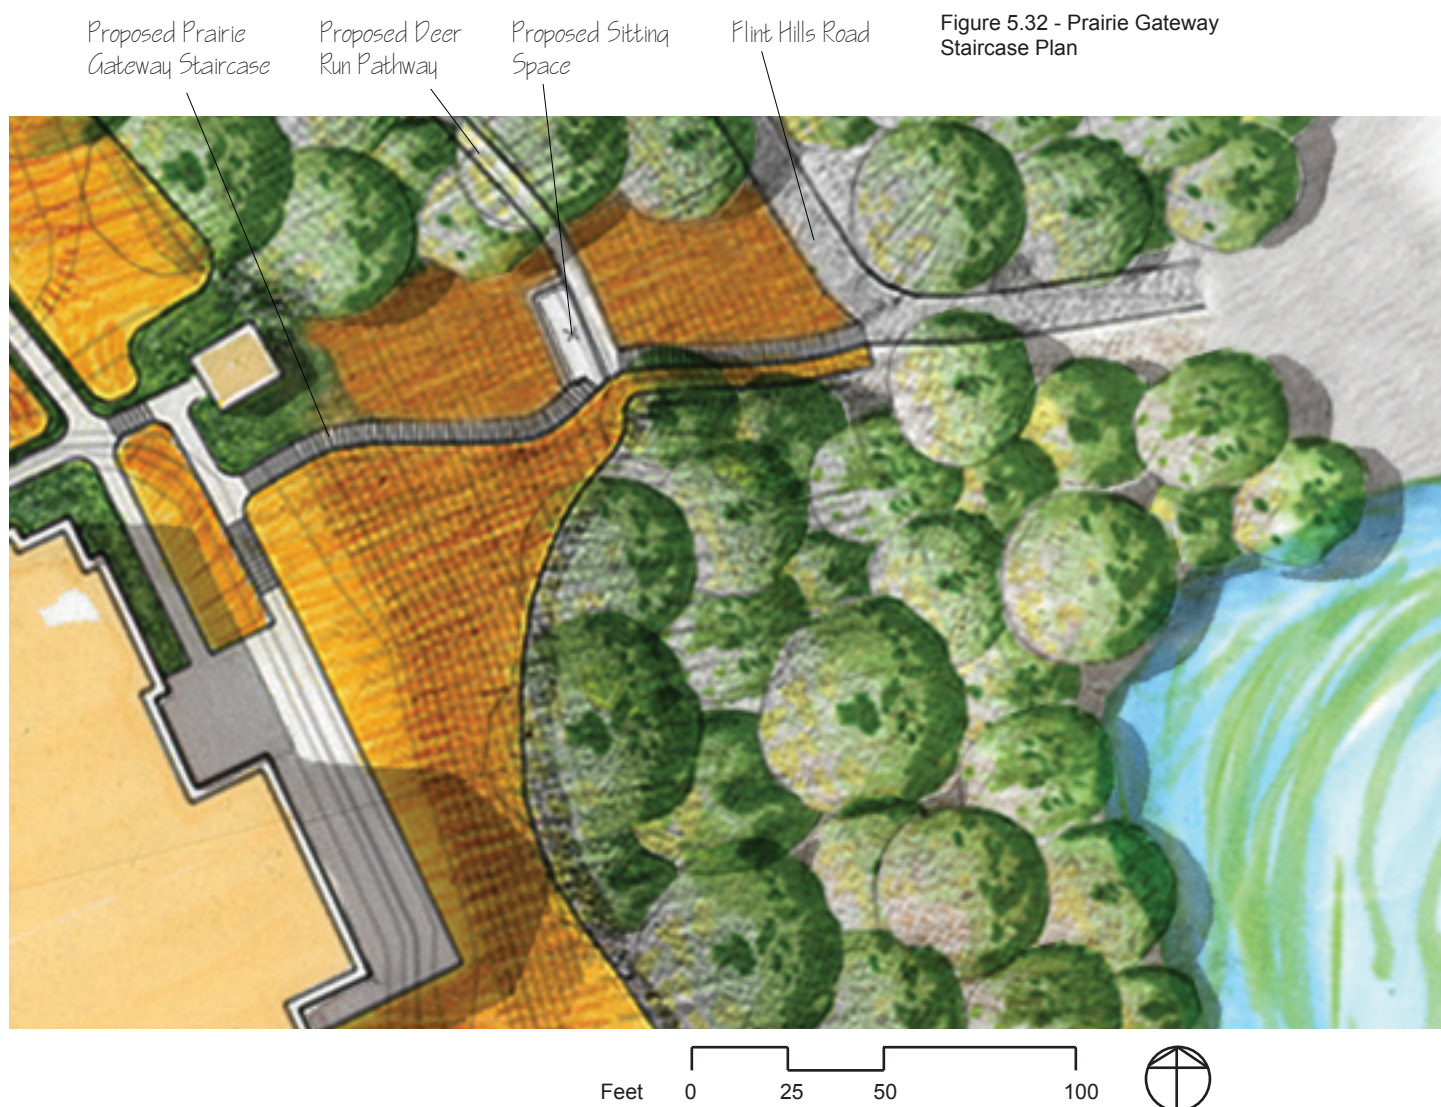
shows how the proposed Prairie Gateway Staircase connects the Ritchie Lodge with the pond area .
